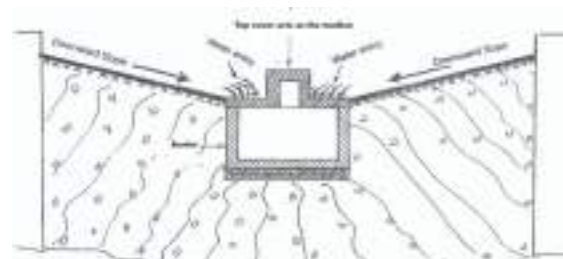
Cross sectional view of a multi-lane highway as per the proposed design. The rain water falling on the road flows freely into the bunkers and get collected. As the bunkers are connected, overflow pipes are not required.
